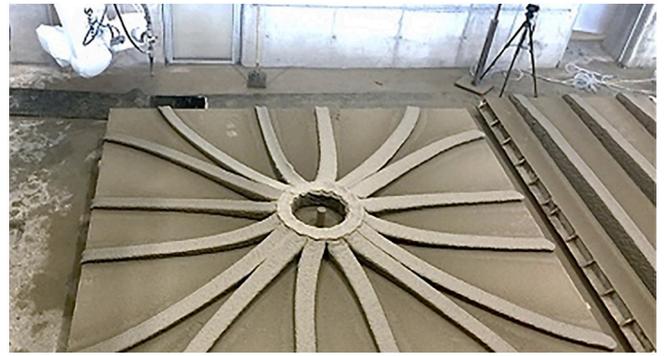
Kloft et al. 2020 [39] imprinted 12cm wide SC3DP concrete ribs for structurally enhancing a thin-plated floor slab for a point-supported column consisting of an 8 cm thick concrete slab with dimensions of 4 m × 4 m.
